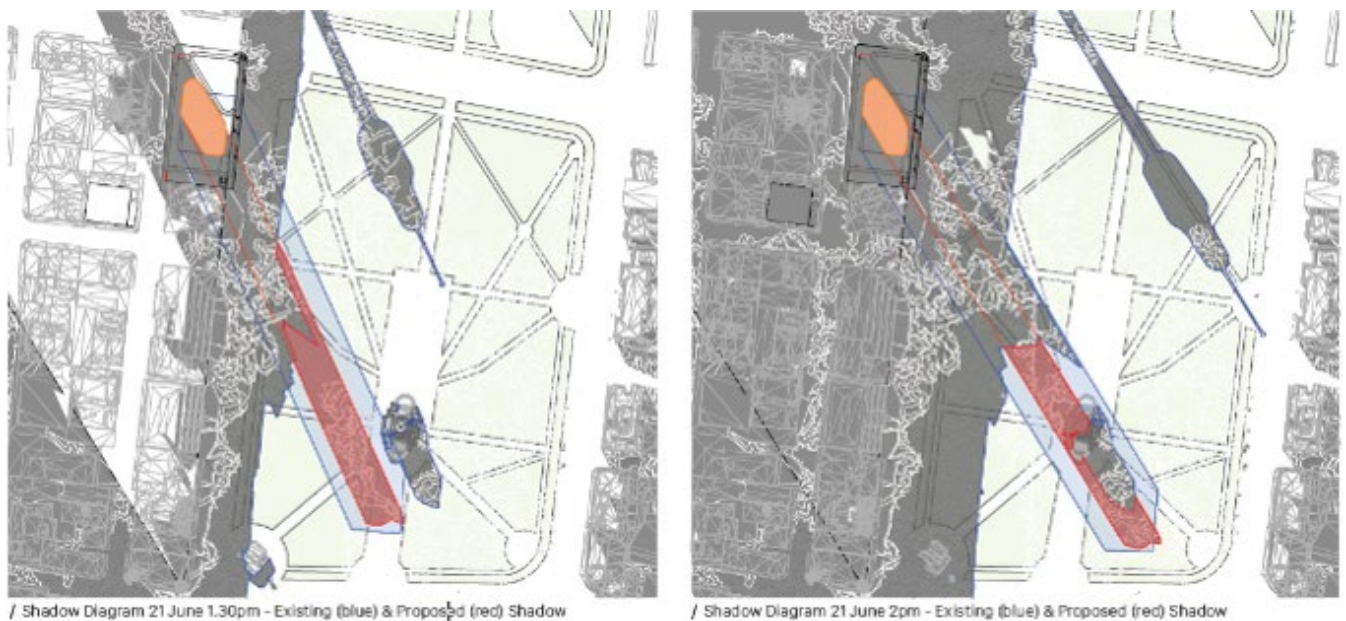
| Shadow diagram 21 June 1.30pm (left) and 2.00pm (right) (existing in blue and proposed in red) (Source: Ethos Urban Modification Report – Building Envelope Design Report)
